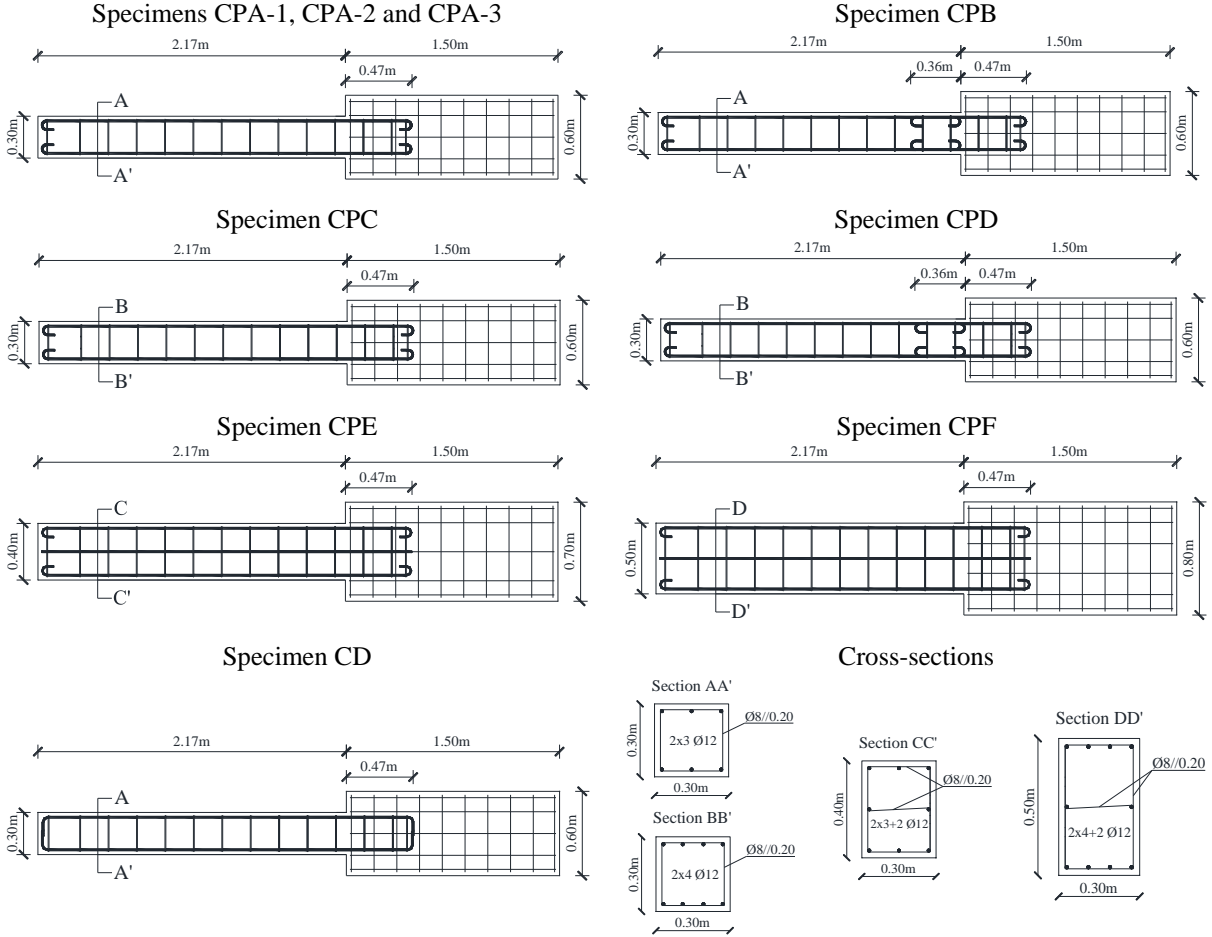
Geometry, dimensions and reinforcement detailing of specimens
